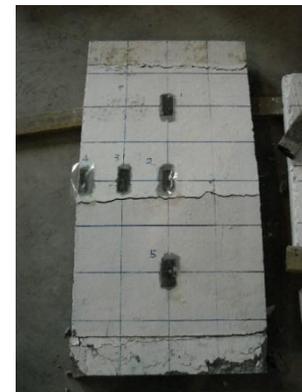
Crack pattern of 40mm thick solid wall on the tension face after failure.
